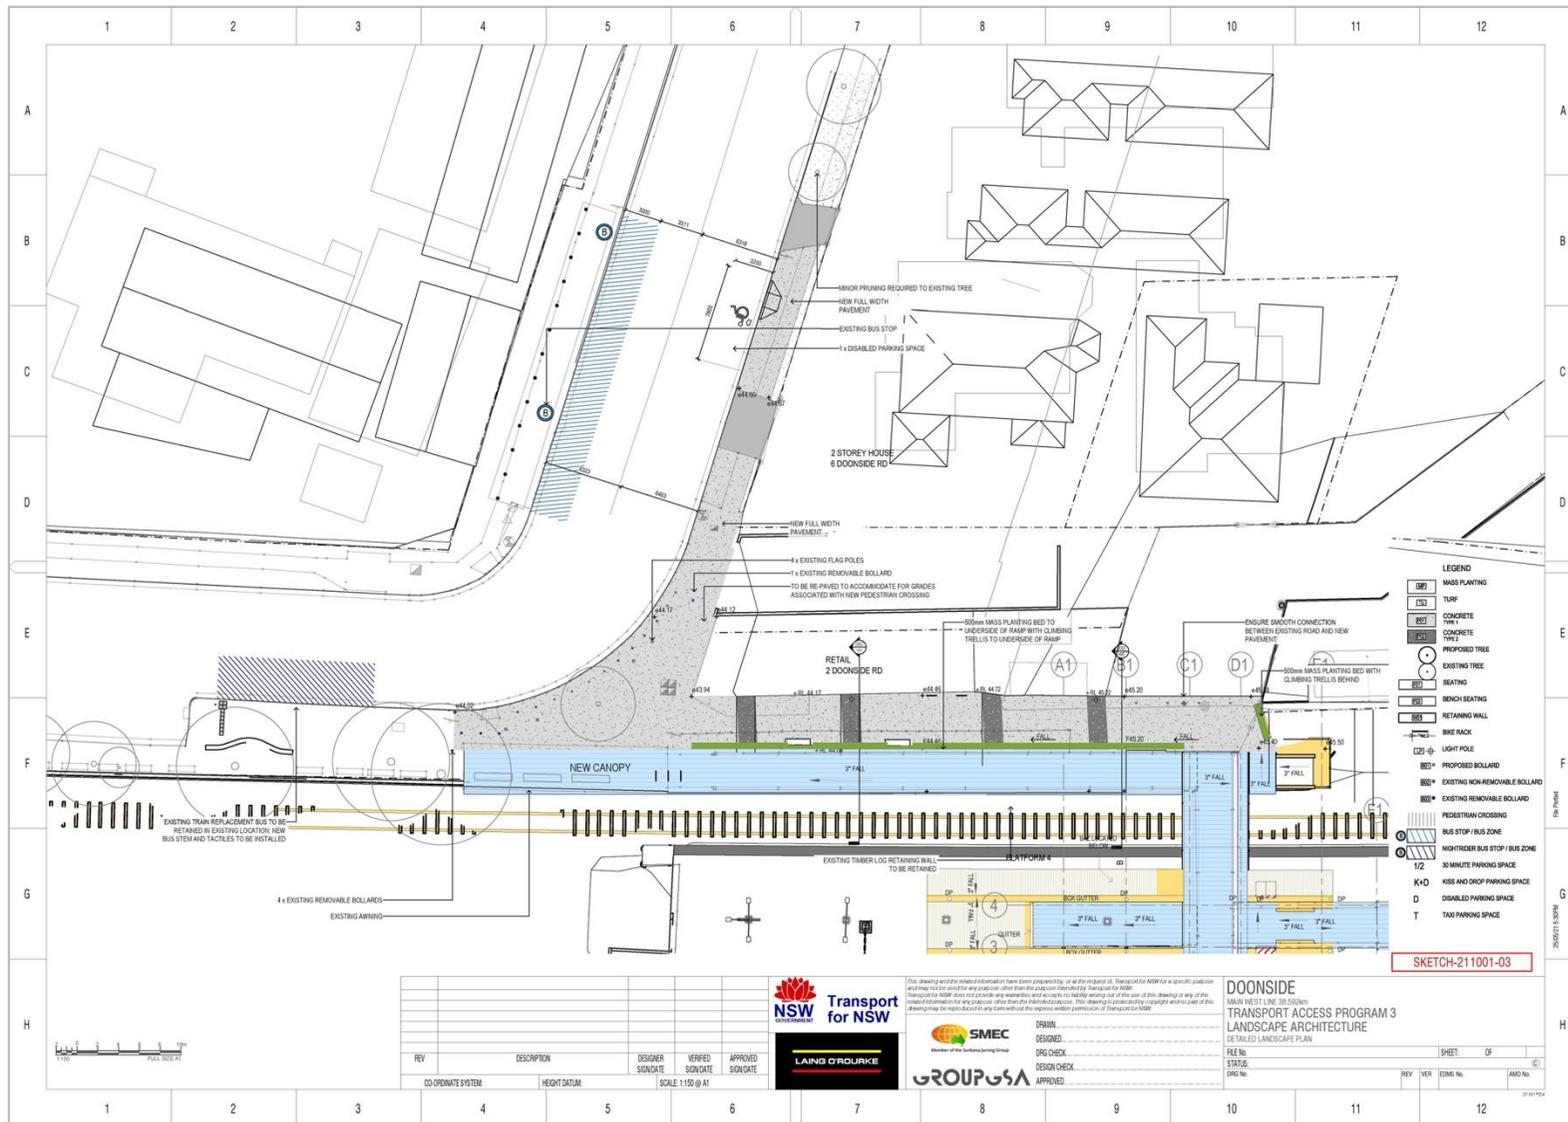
Concept Landscape Plan - southern side of station<sup>6</sup>
